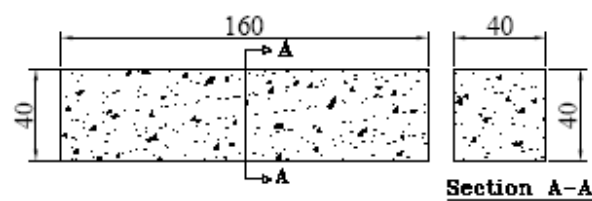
Geometry of used specimens for flexural test (dimensions in mm)
